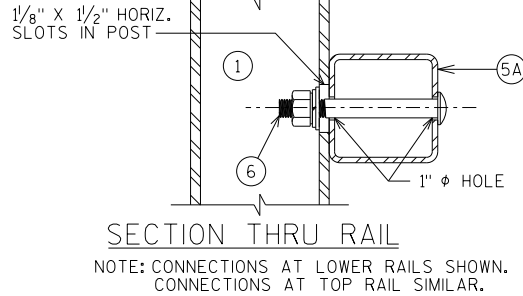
DETAIL AT END POST THRIE BEAM RAIL ATTACHMENT
